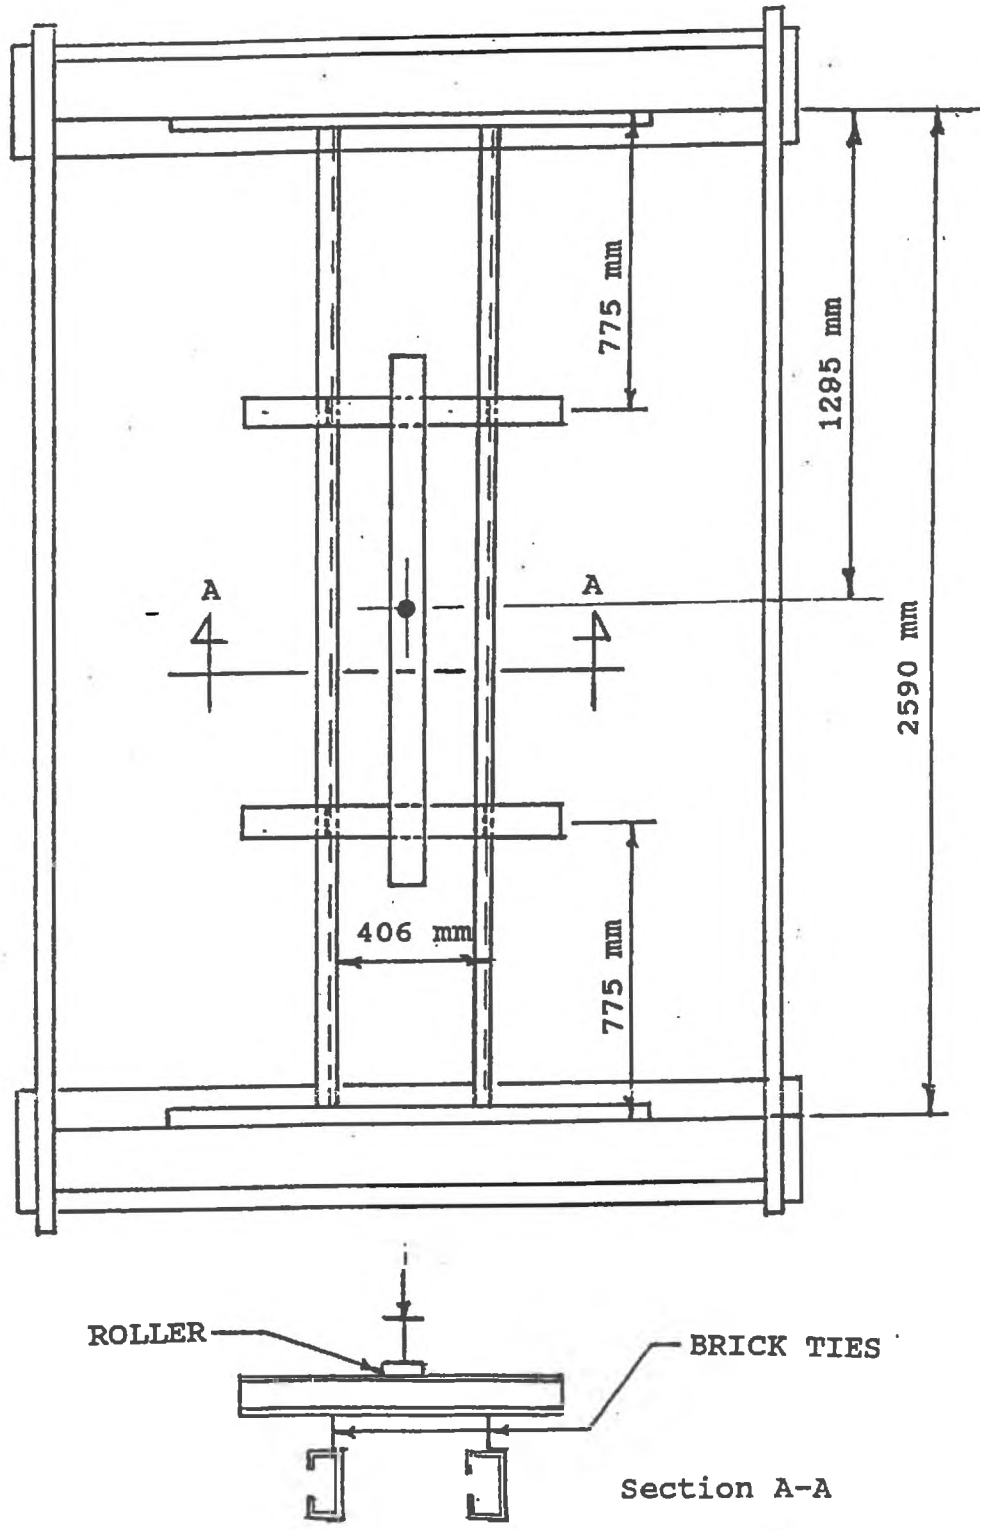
Test Setup for 2 Stud Backup Wall Specimen
